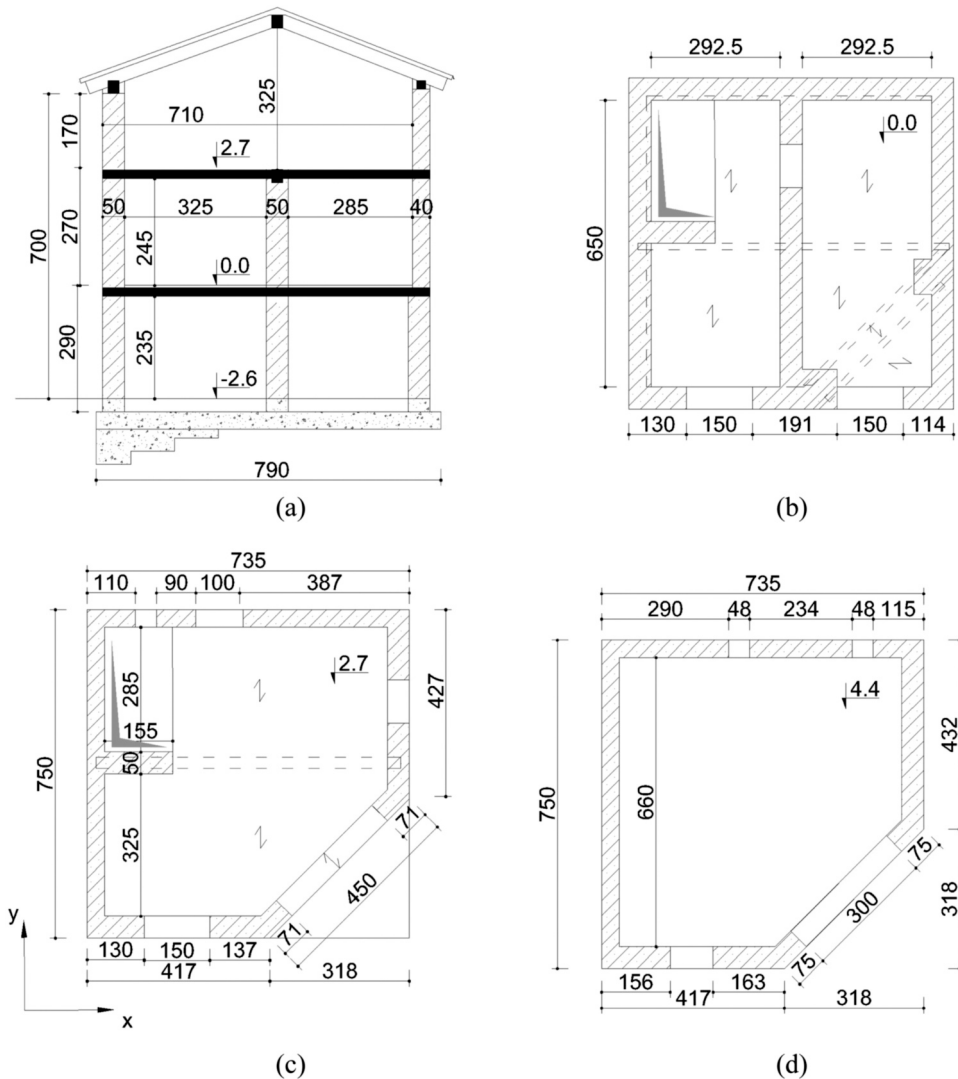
Vertical section (a) and horizontal section of first (b), second (c) and third (d) level of a 3-floor stone masonry building. The dimensions are in centimeters.
